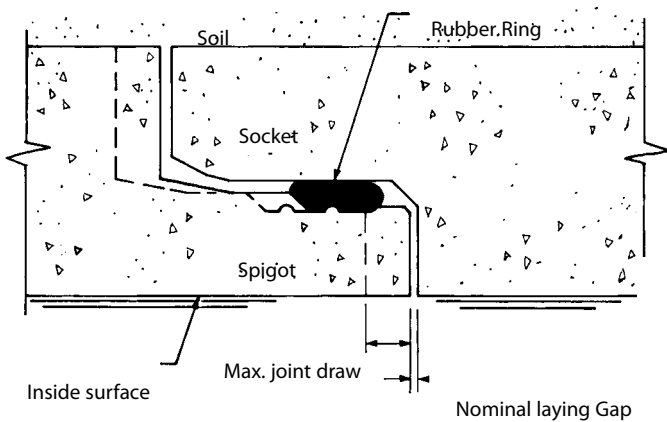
, RRJ Pipe with In-wall (Skid) Joint
